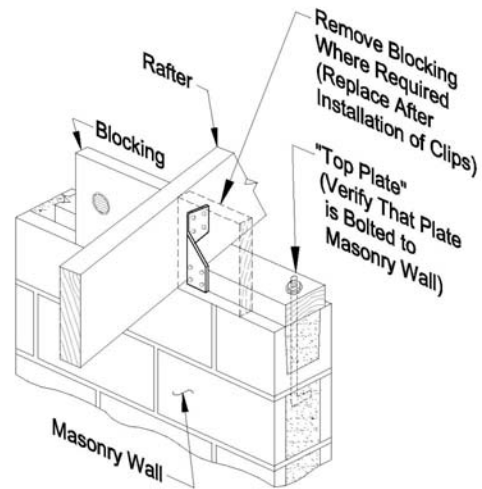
A: Roof to Wall Uplift Resistant Ties for "Single Wall" Construction— Existing Fascia Not Extending Below Rafter
